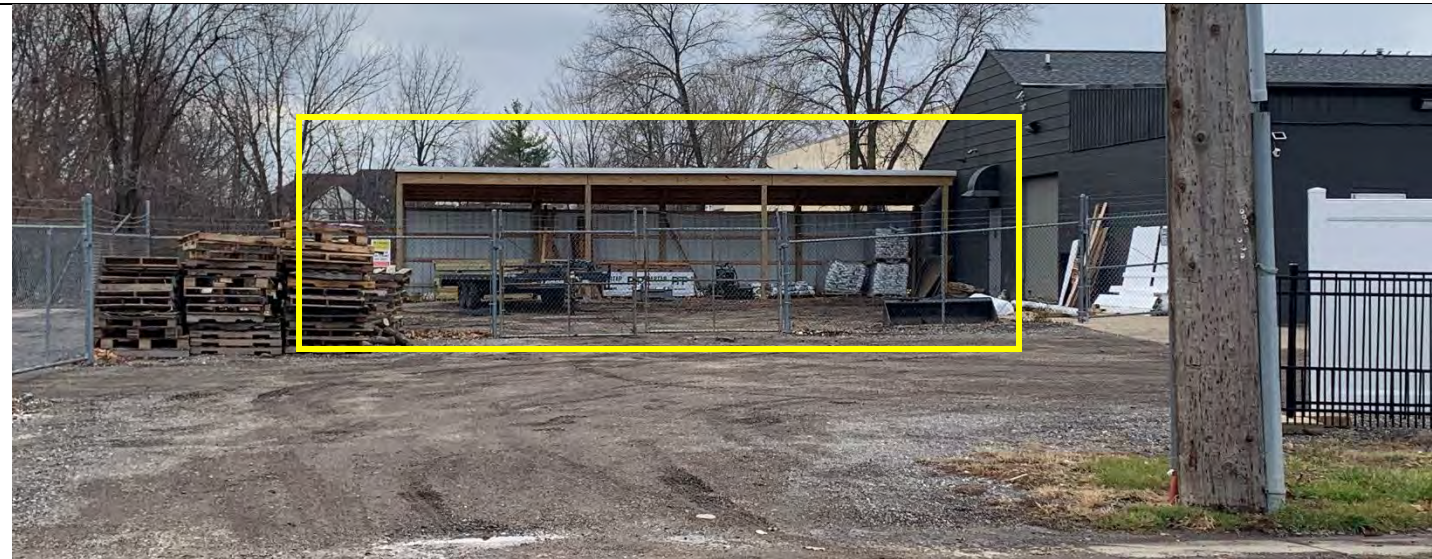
Streetview looking south towards accessory structure (yellow box).
